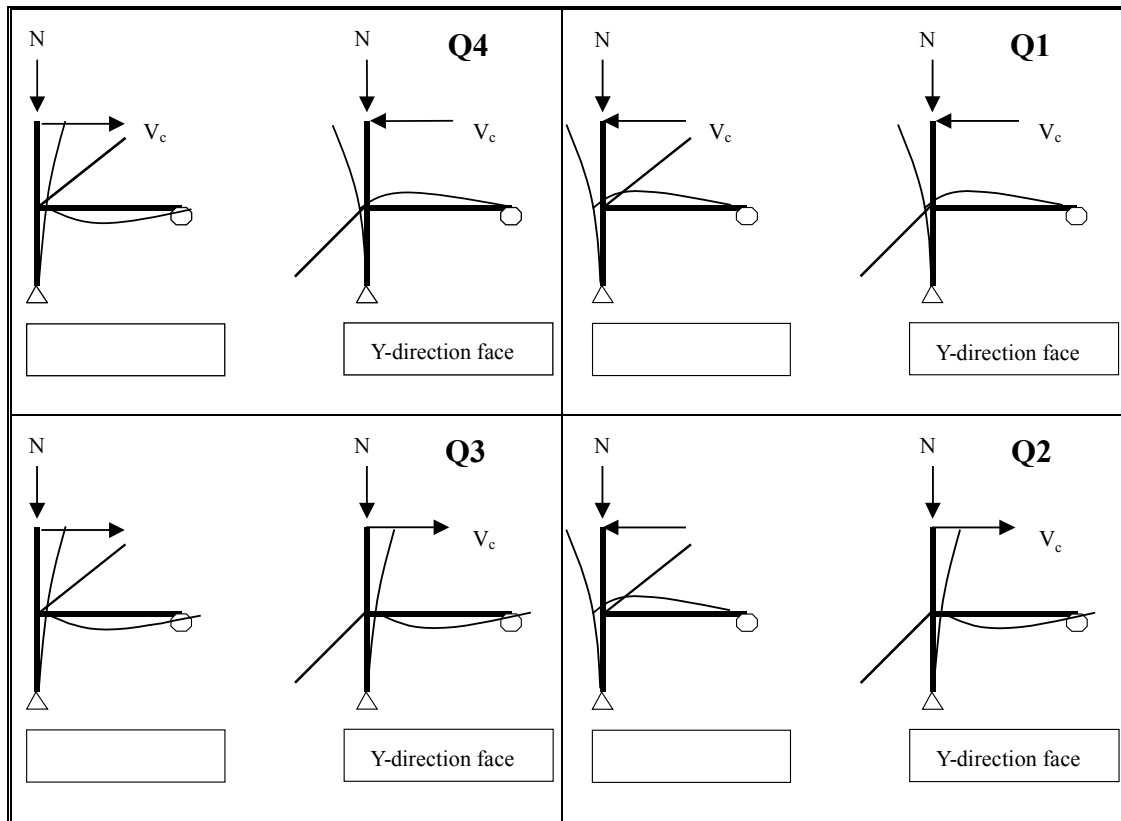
Definition of loading direction and deformed shape for 3-D tests
